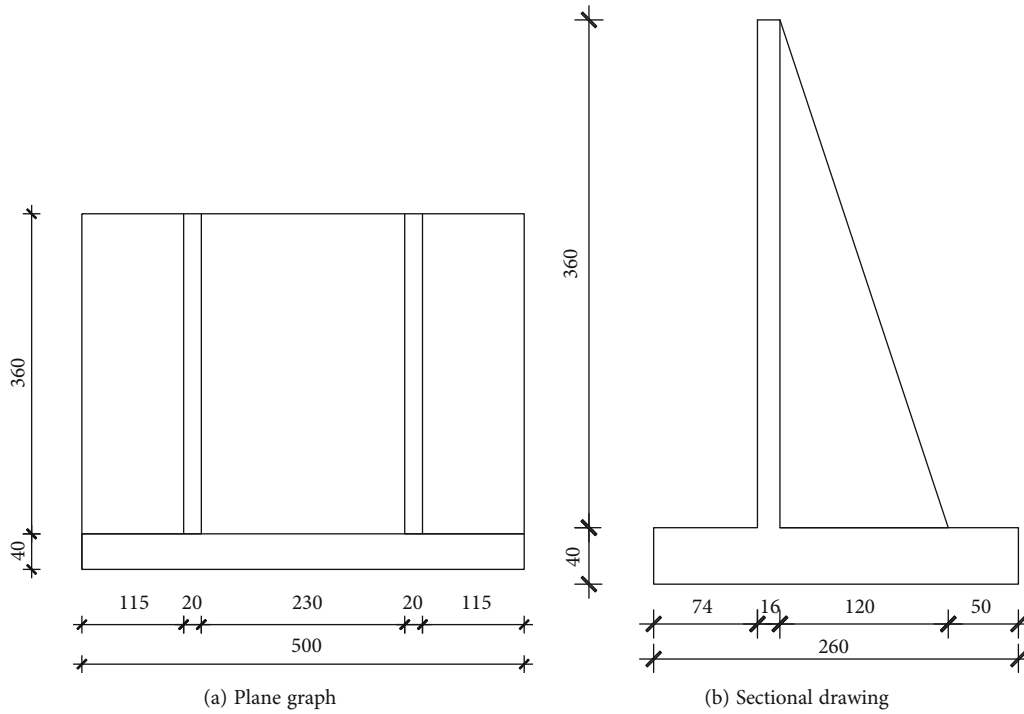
Size of buttressed earth-retaining wall (unit: mm).
